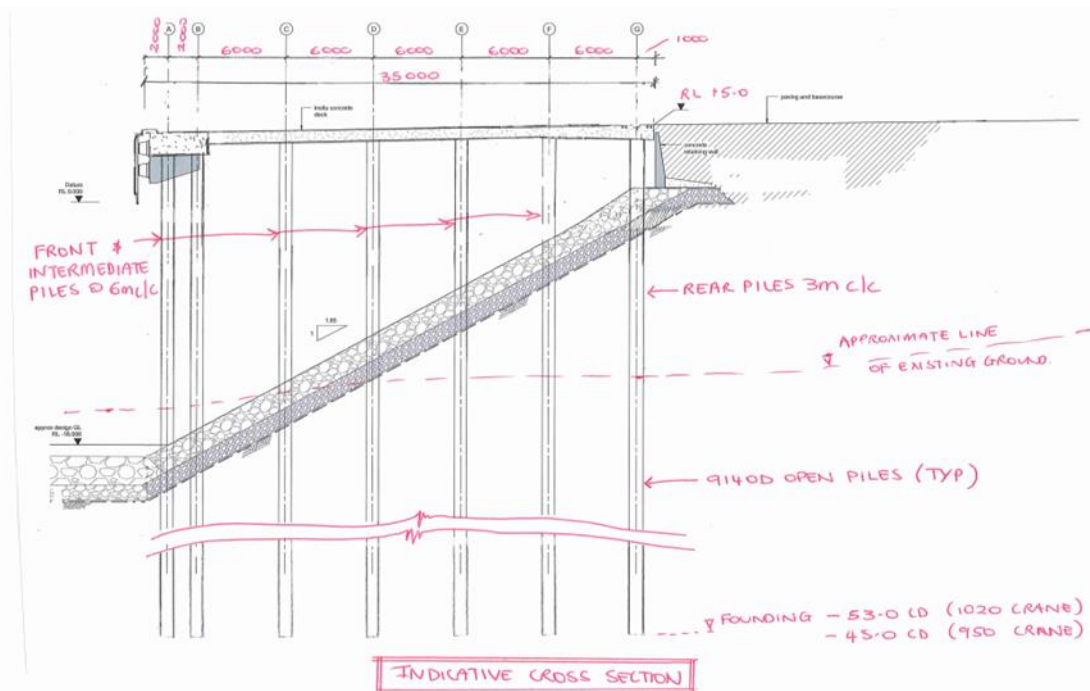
Concept cross section of open piled marginal wharf with rock revetment
